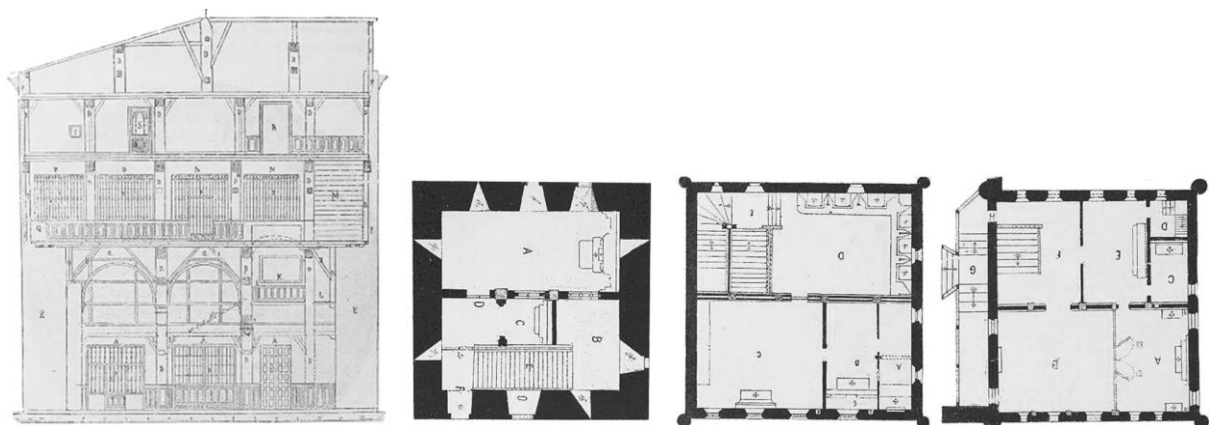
1891 Drawings: Ground, second and third floors and section (Pérez 1891)
